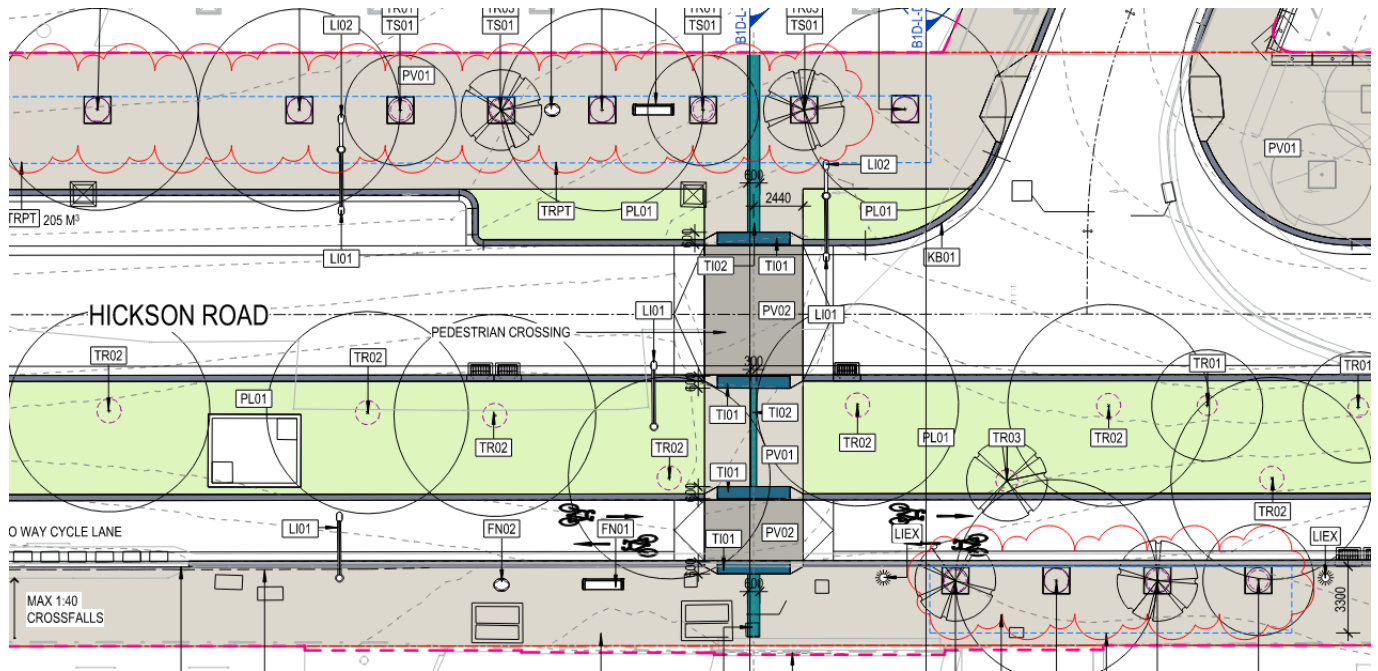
Plan of new raised Hickson Road double pedestrian crossings near Barton Street
